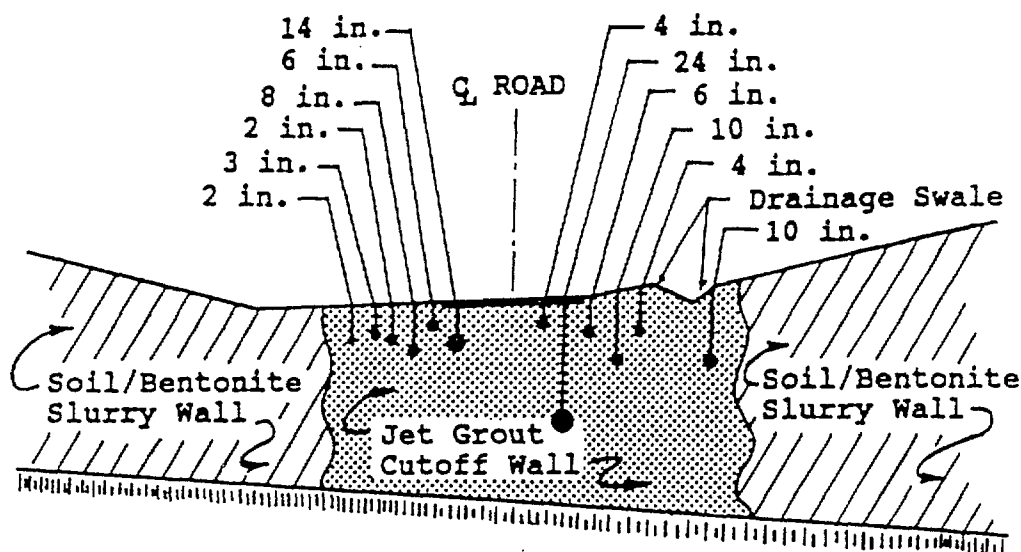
Construction of Cutoff Wall at Utility Crossing by Jet Grouting (Gazaway and Jasperse, 1992). (1 in. ≈ 25 mm.)
